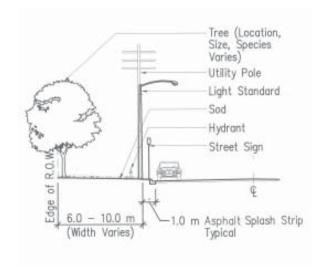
b - Existing Road Edge Condition 1 No Sidewalk
